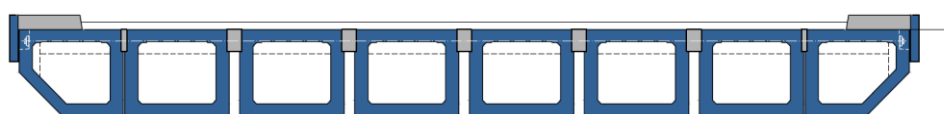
Cross section of prefab deck using box beams – Spanbeton
